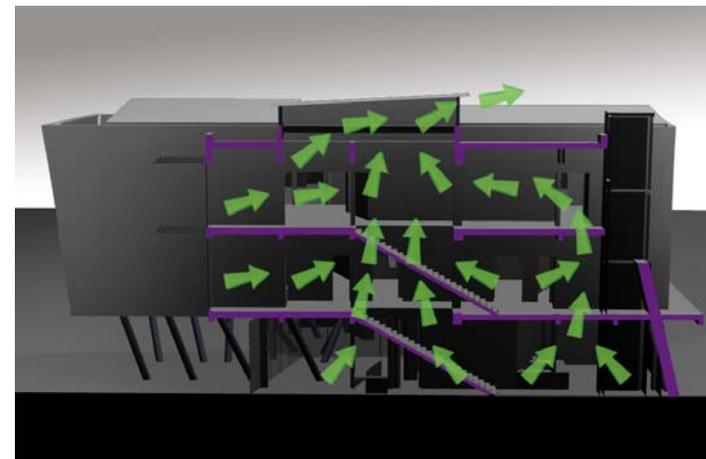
Airflow in the Central core between the three floors to the clerestory windows
